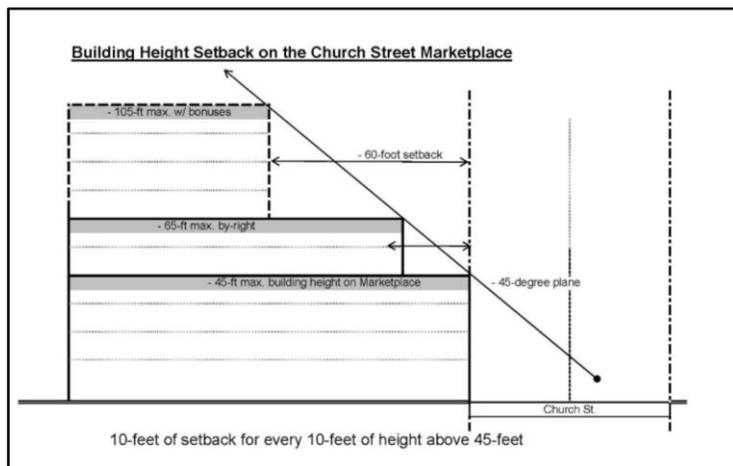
Measuring Height Limits for Church Street Buildings
